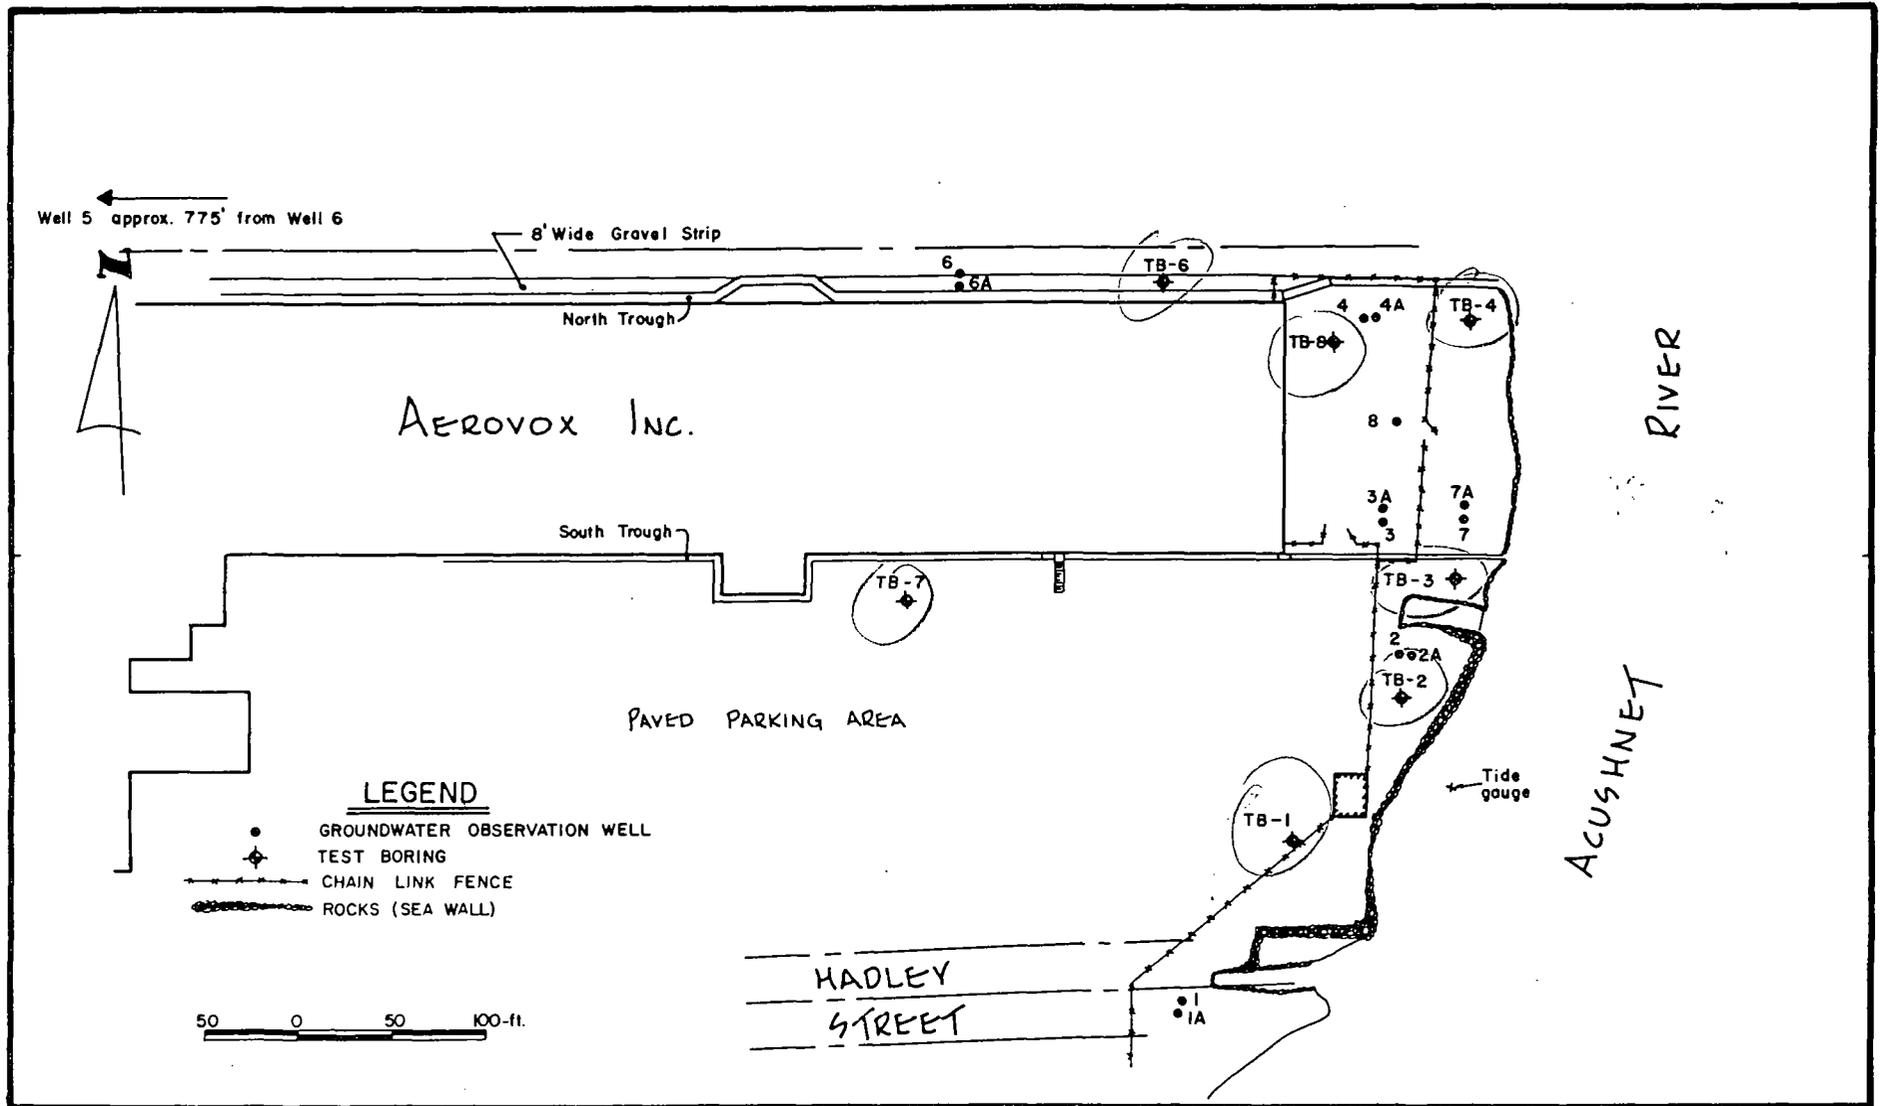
SITE PLAN SHOWING TEST BORING AND OBSERVATION WELL LOCATIONS
